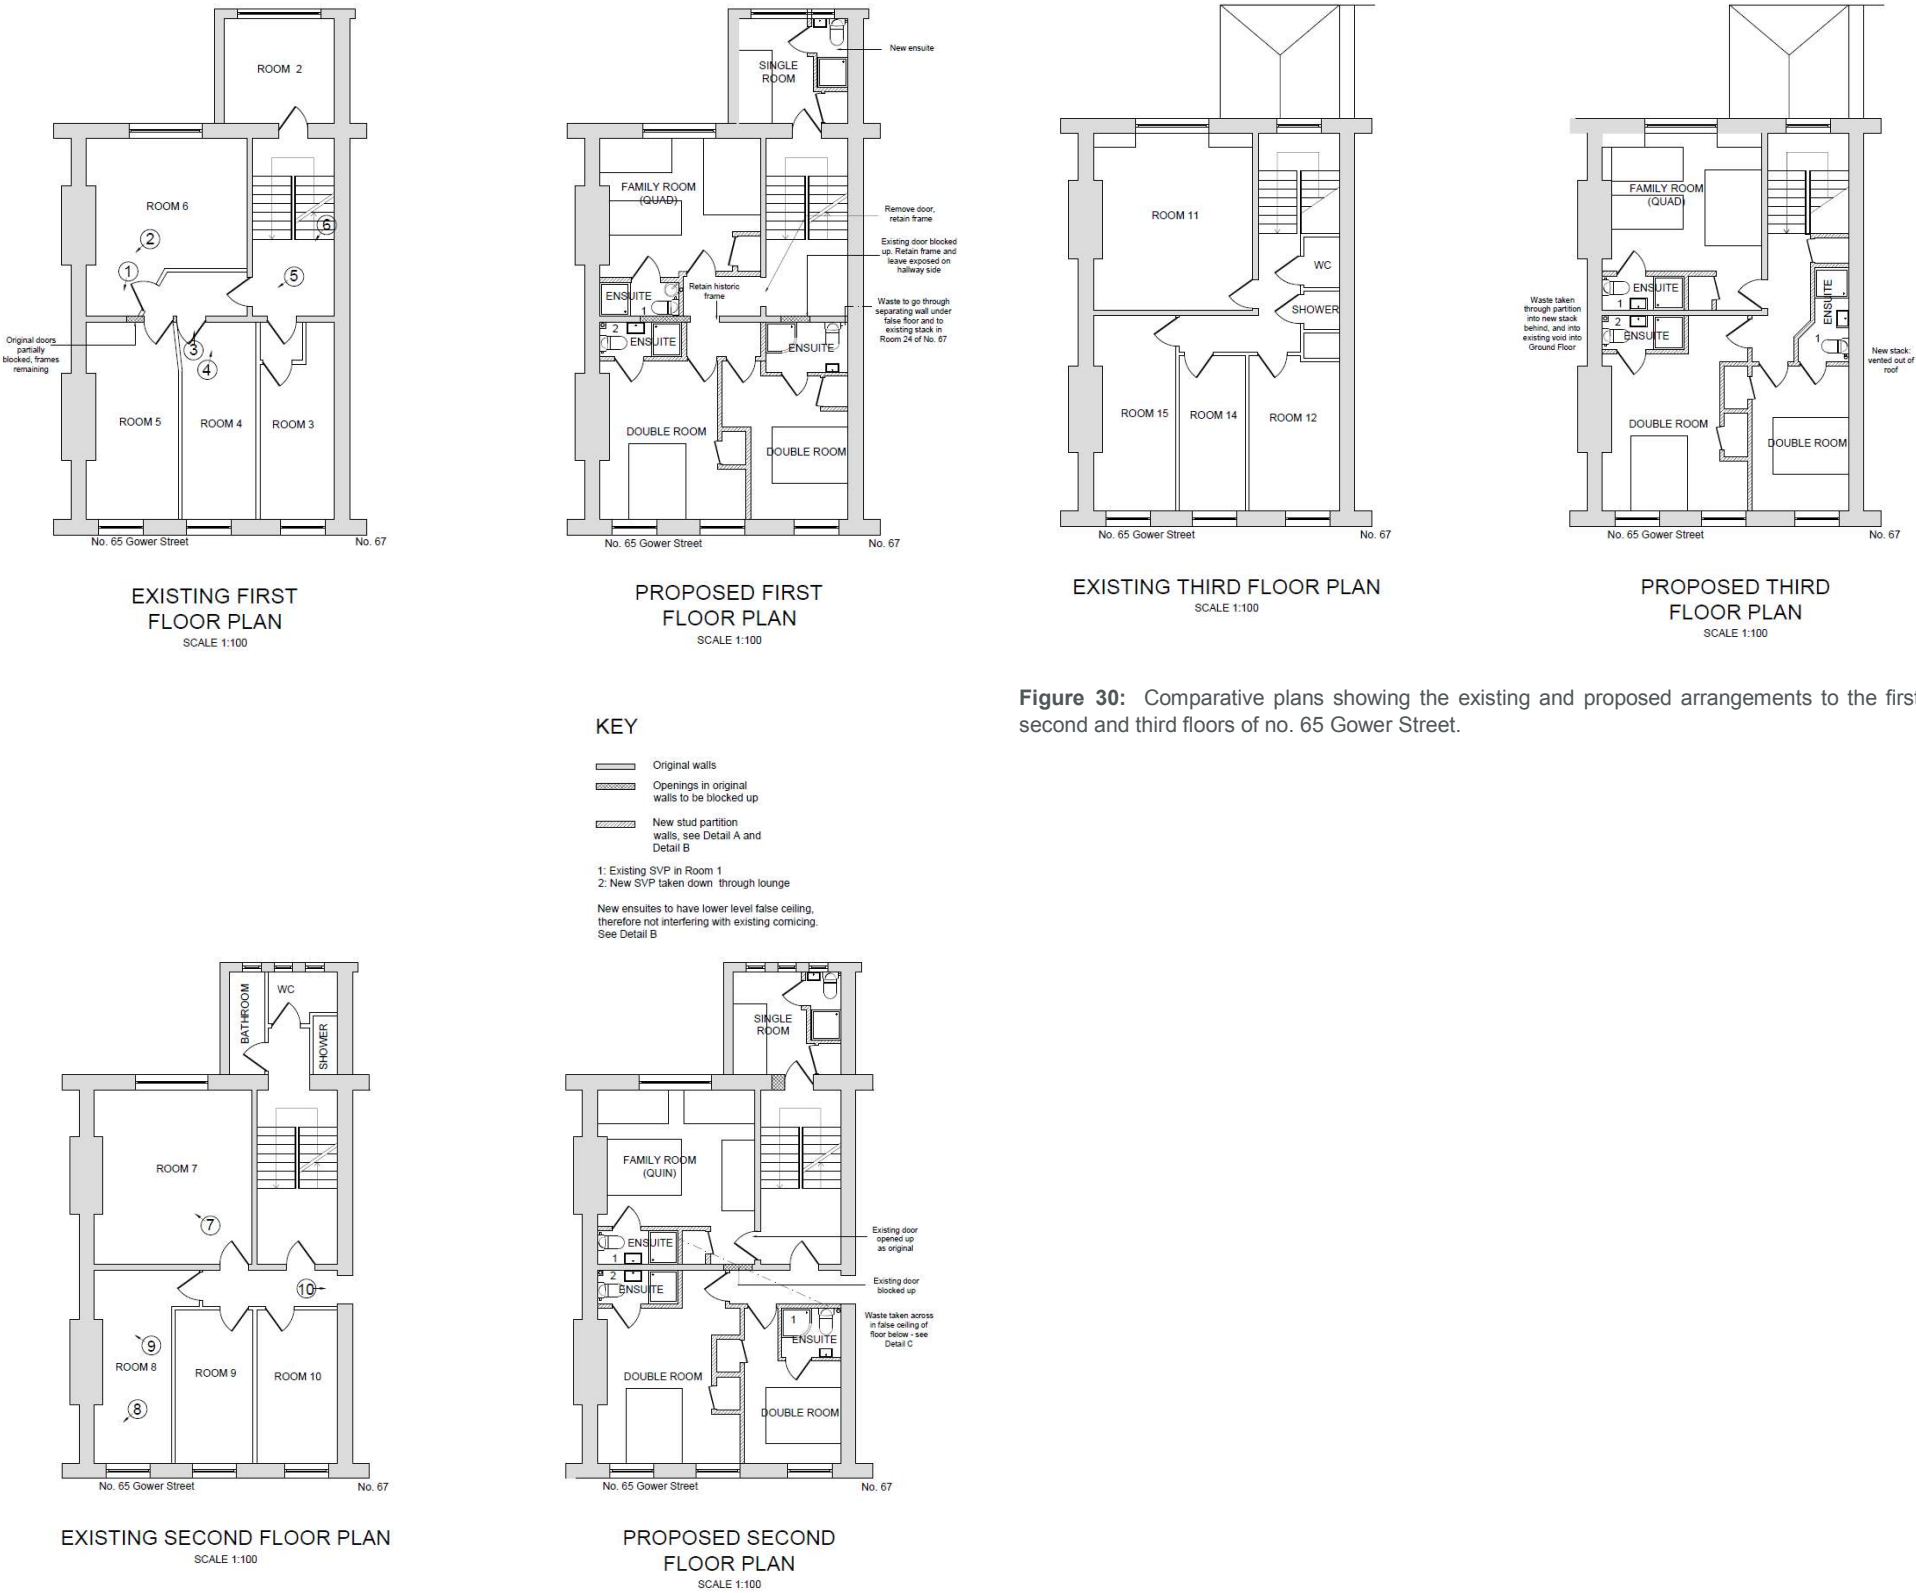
Comparative plans showing the existing and proposed arrangements to the first, second and third floors of no. 65 Gower Street.
